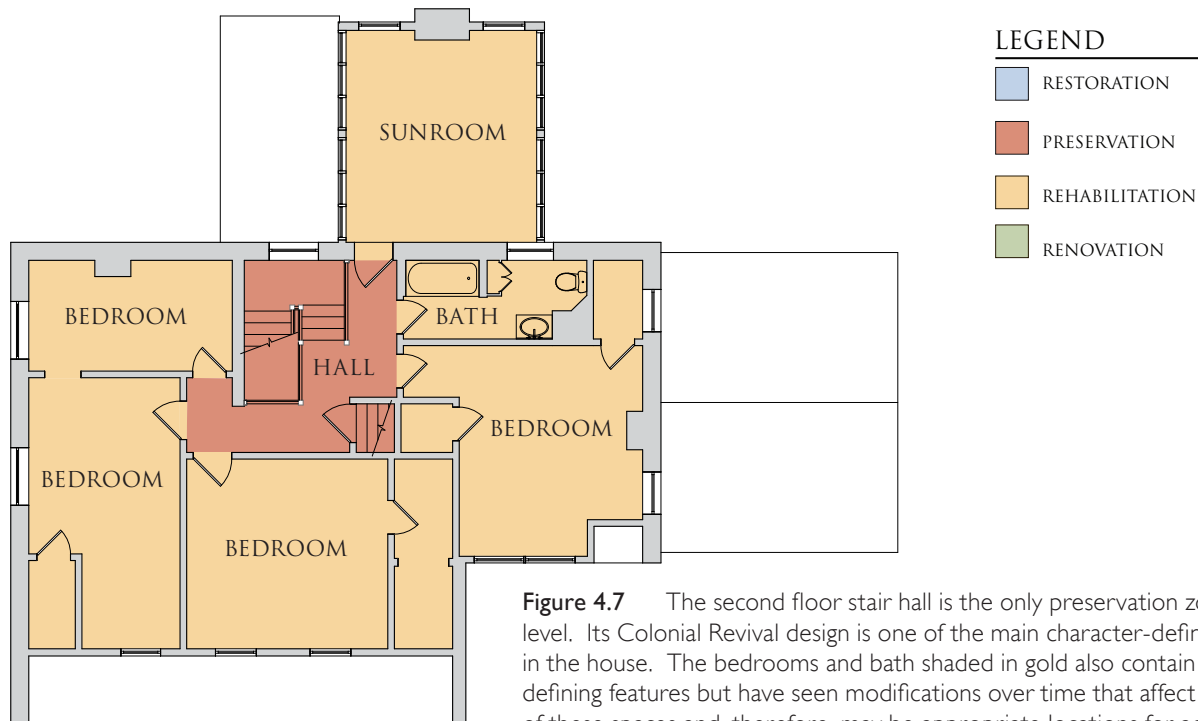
The second floor stair hall is the only preservation zone on this level. Its Colonial Revival design is one of the main character-defining features in the house. The bedrooms and bath shaded in gold also contain character-defining features but have seen modifications over time that affect the integrity of these spaces and, therefore, may be appropriate locations for additional modifications to fit the chosen program for the building.
